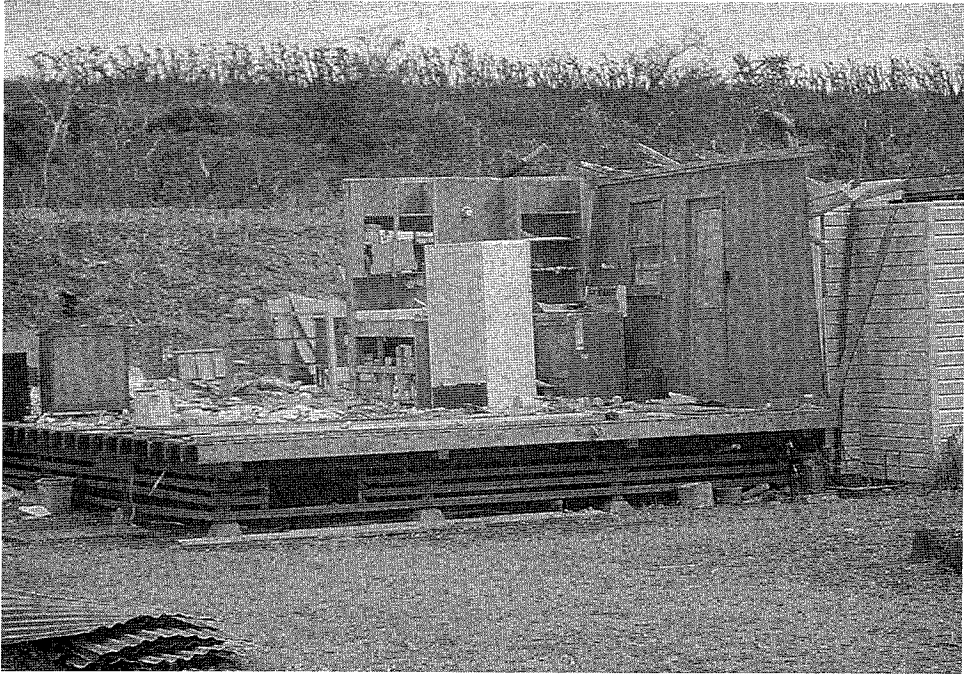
Damaged house showing the vulnerability of single-wall construction.
